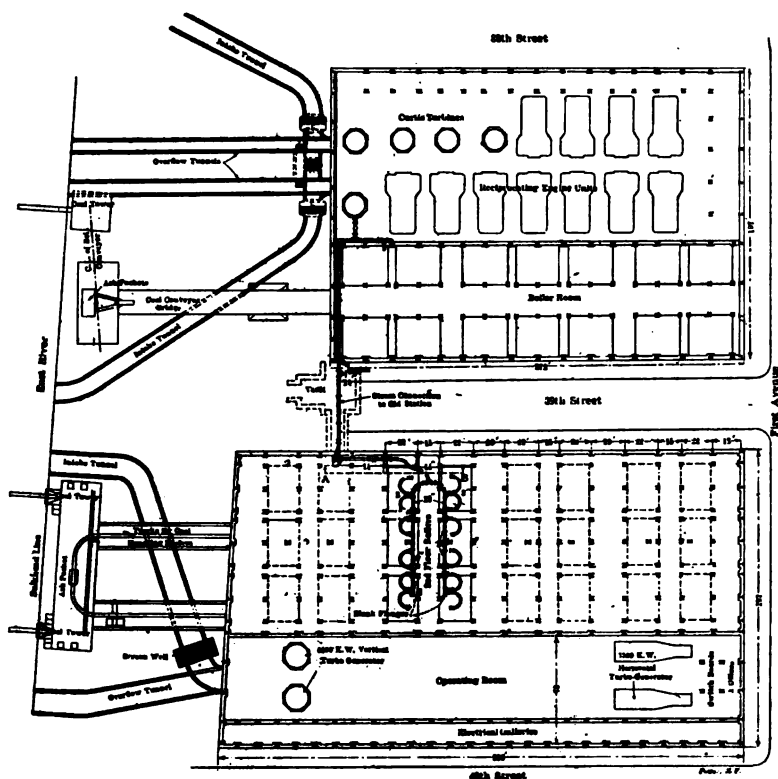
B.—New York Edison Co.'s Plan of Old and New Waterside Stations.
